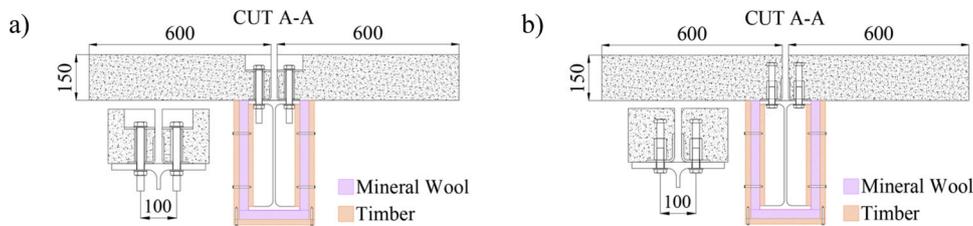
Cross-section of the composite beams for the fire tests: a) FIREDUCE-FR-P3; b) FIREDUCE-FR-P15 (dimensions in mm).
